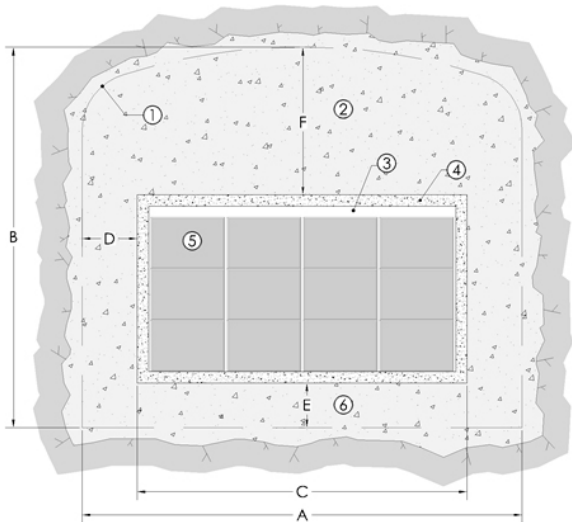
Schematic cross-sectional layout of the BHK vault for metallic waste (from Elfving et al. 2013). Legend: 1.) Theoretical tunnel contour. 2) Concrete backfill. 3) Grout. 4) Concrete structure. (0.5 m). 5) Steel tanks. 6) Concrete. Approximated dimensions: $A = 20.6$ m, $B = 19.6$ m, $C = 15$ m, $D = 2.8$ m, $E = 2.4$ m, $F = 8.8$ m.
